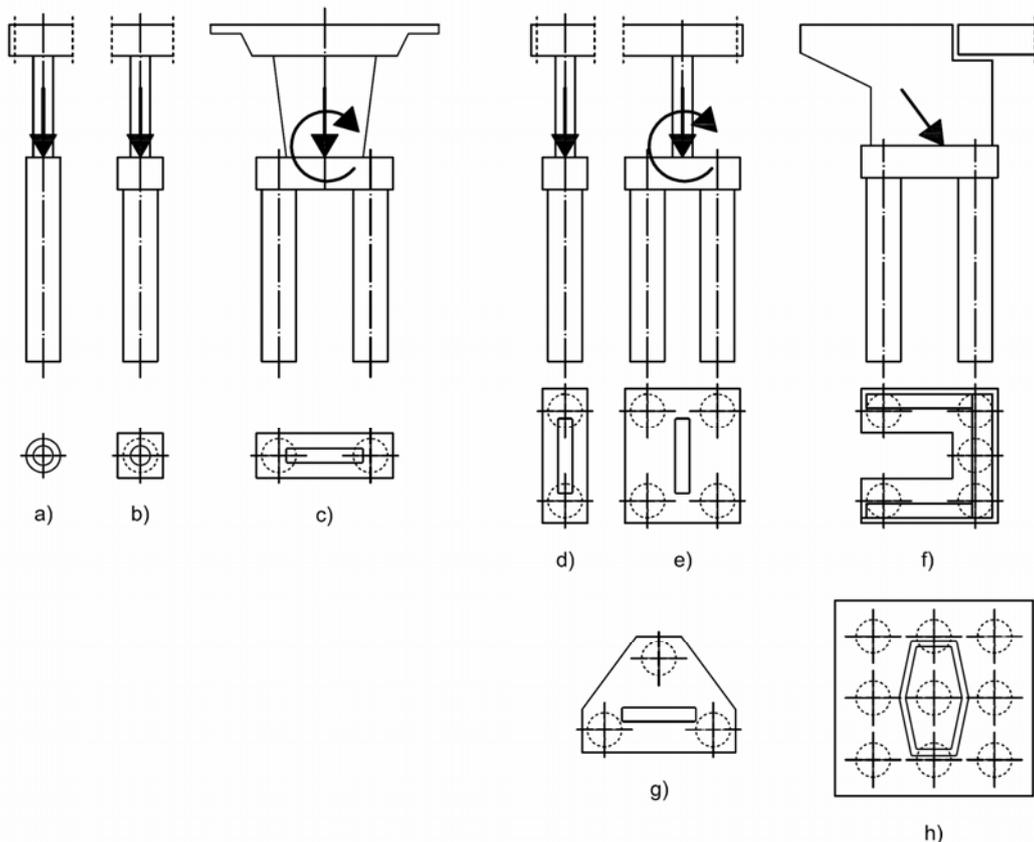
Possible arrangements of bored piles below bridge piers
